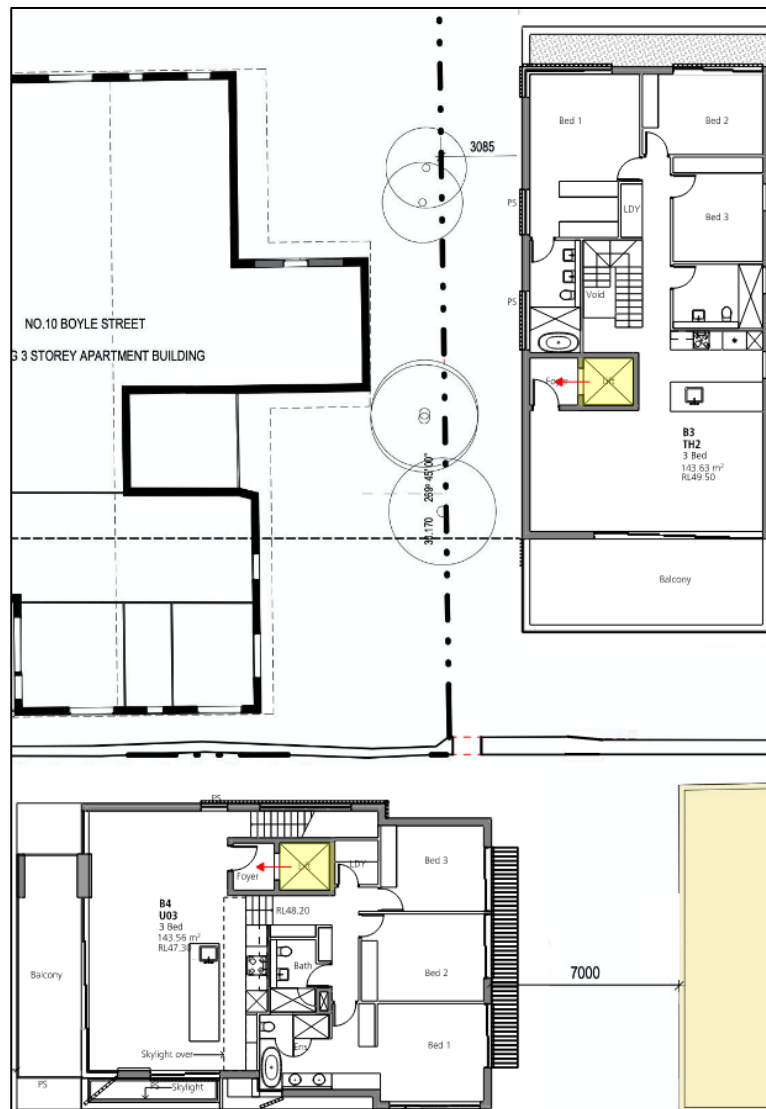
Lift opening directly into TH2 and U03 at First Floor
